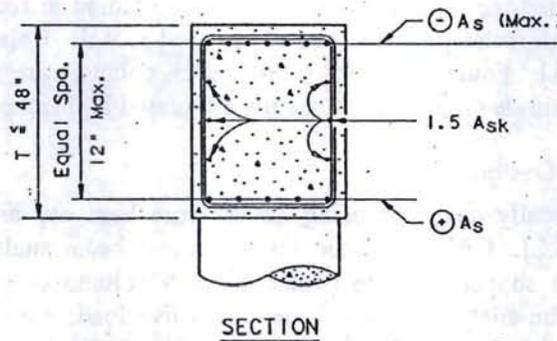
Typical Bent Cap Reinforcement—Rectangular Cross Section [6.1]
